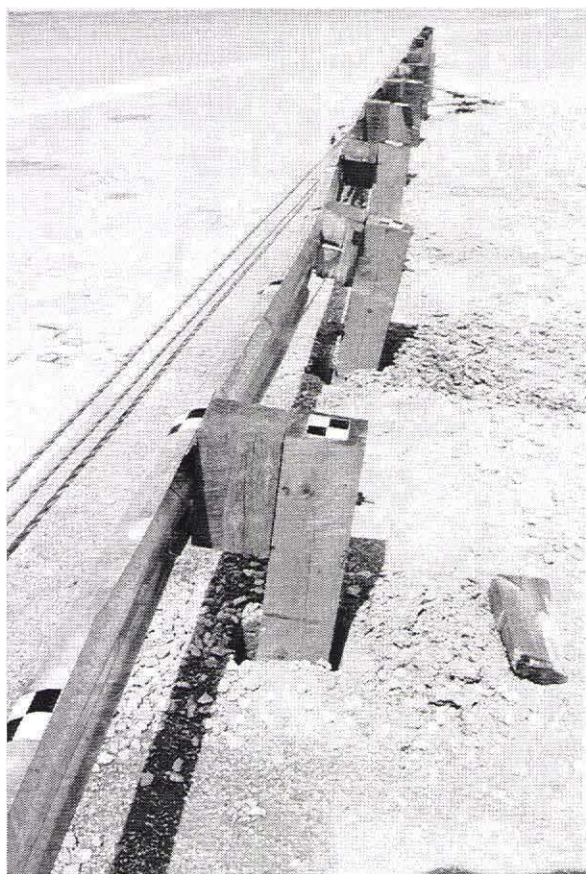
Cable Guardrail to W-Beam Transition Damage, Test SDC-3
